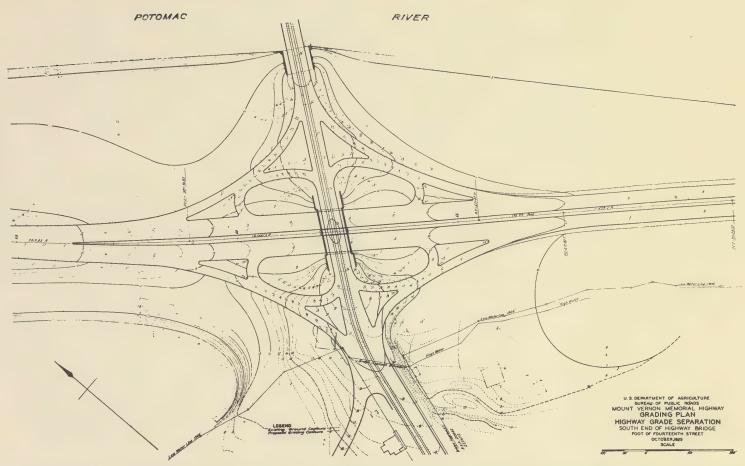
Grading plan of the highway grade separation at the south end of the Highway Bridge across the Potomac River. The highway will pass under the present Alexandria road, and in order to make suitable connection with the Highway Bridge a system of ramps has been provided, which will permit the distribution of traffic in all directions without any left turns or cross traffic. Divided roadways are used approaching this grade separation. The island between the roadways serves as an effective means of preventing left turns and simplifies the scheme of circulation. Extra pavement width is provided on the Memorial Highway at the grade separation, so that traffic over the highway at all times will have clear, unobstructed right of way
